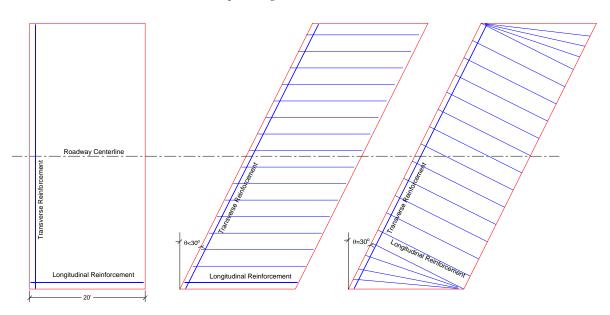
Proposed orientation of longitudinal reinforcement in approach slabs with no, low and high skew angles
